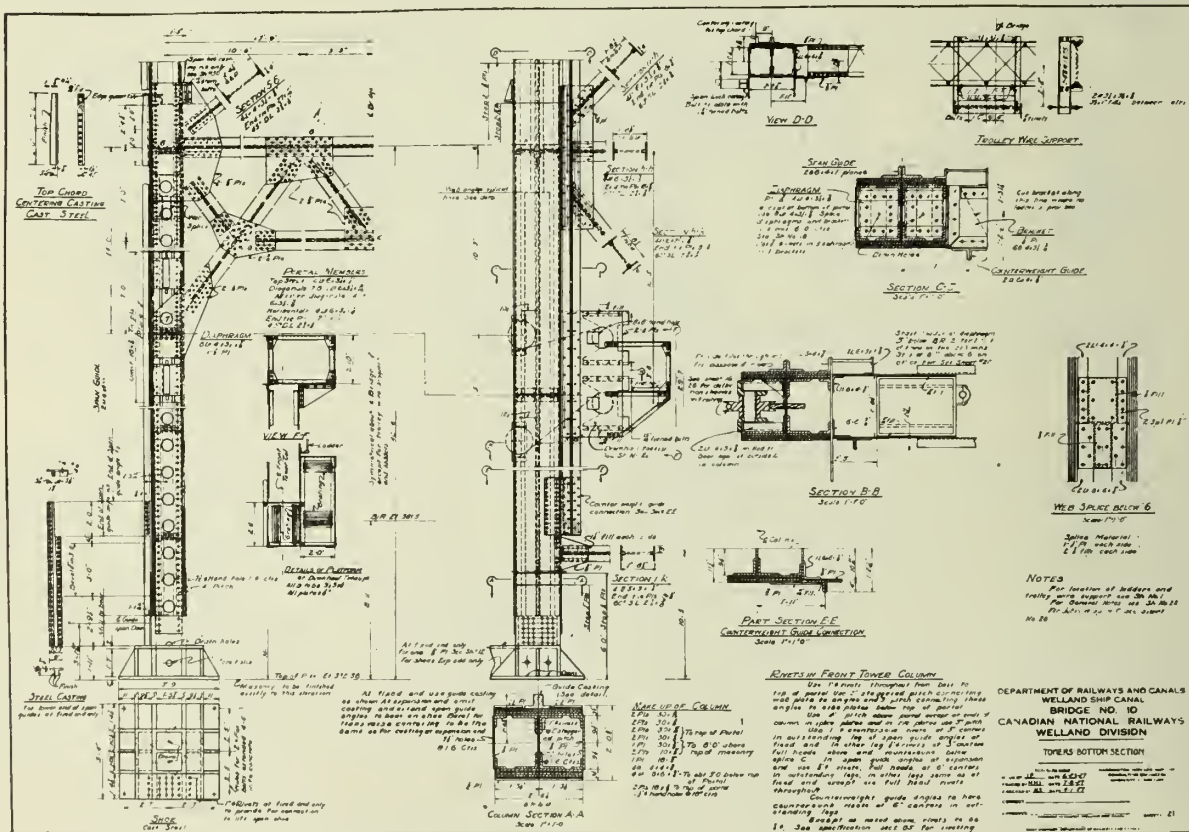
Bridge No. 10—Towers—Bottom Section.
